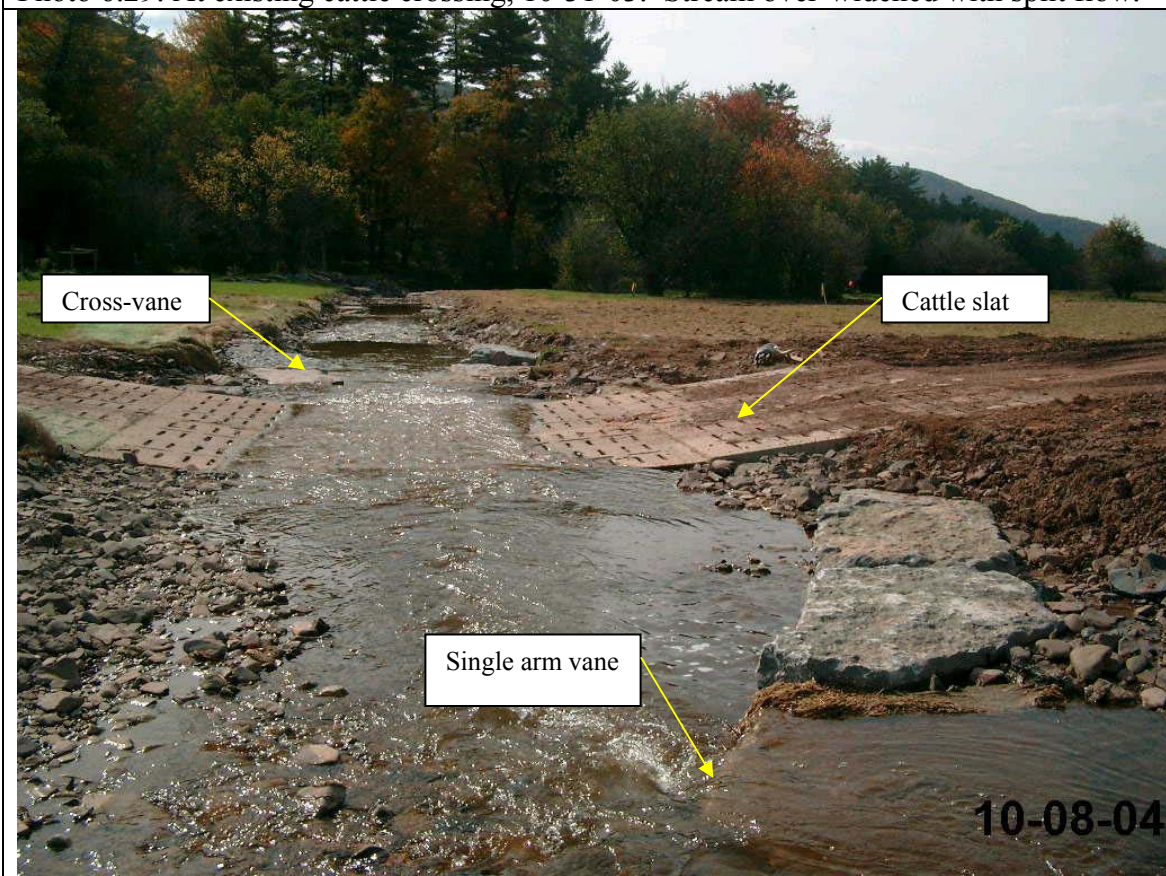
Looking D.S. at cattle slat, 10-08-04
